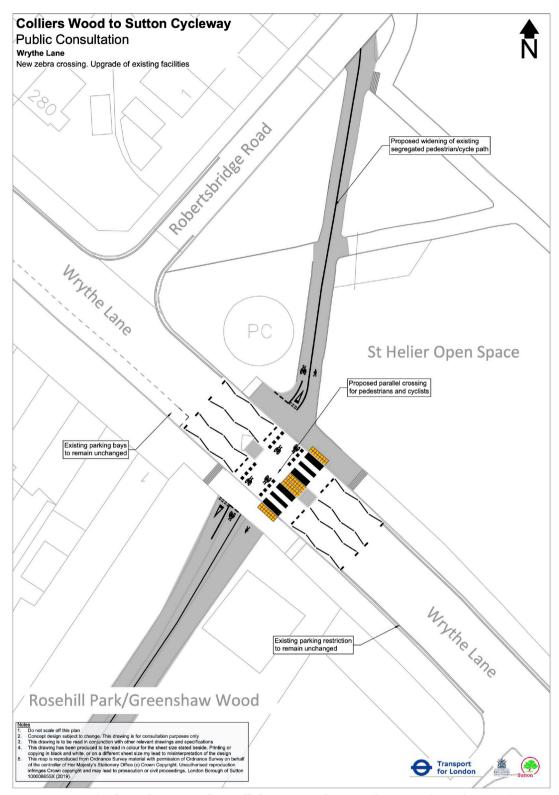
Plan of proposed parallel crossing for Wrythe Lane (LB of Sutton)
